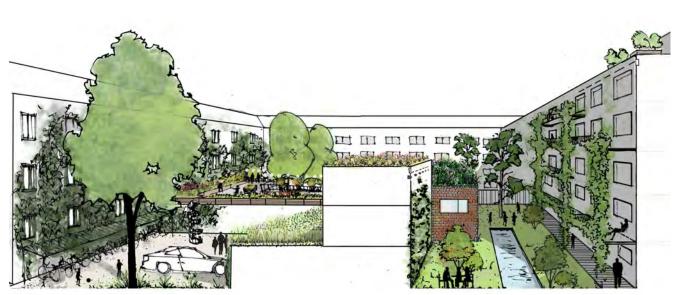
Cross-section view of a perimeter-development courtyard with façade greening, rooftops used as biotope or garden and greened courtyards with trees and open water points (own illustration)
